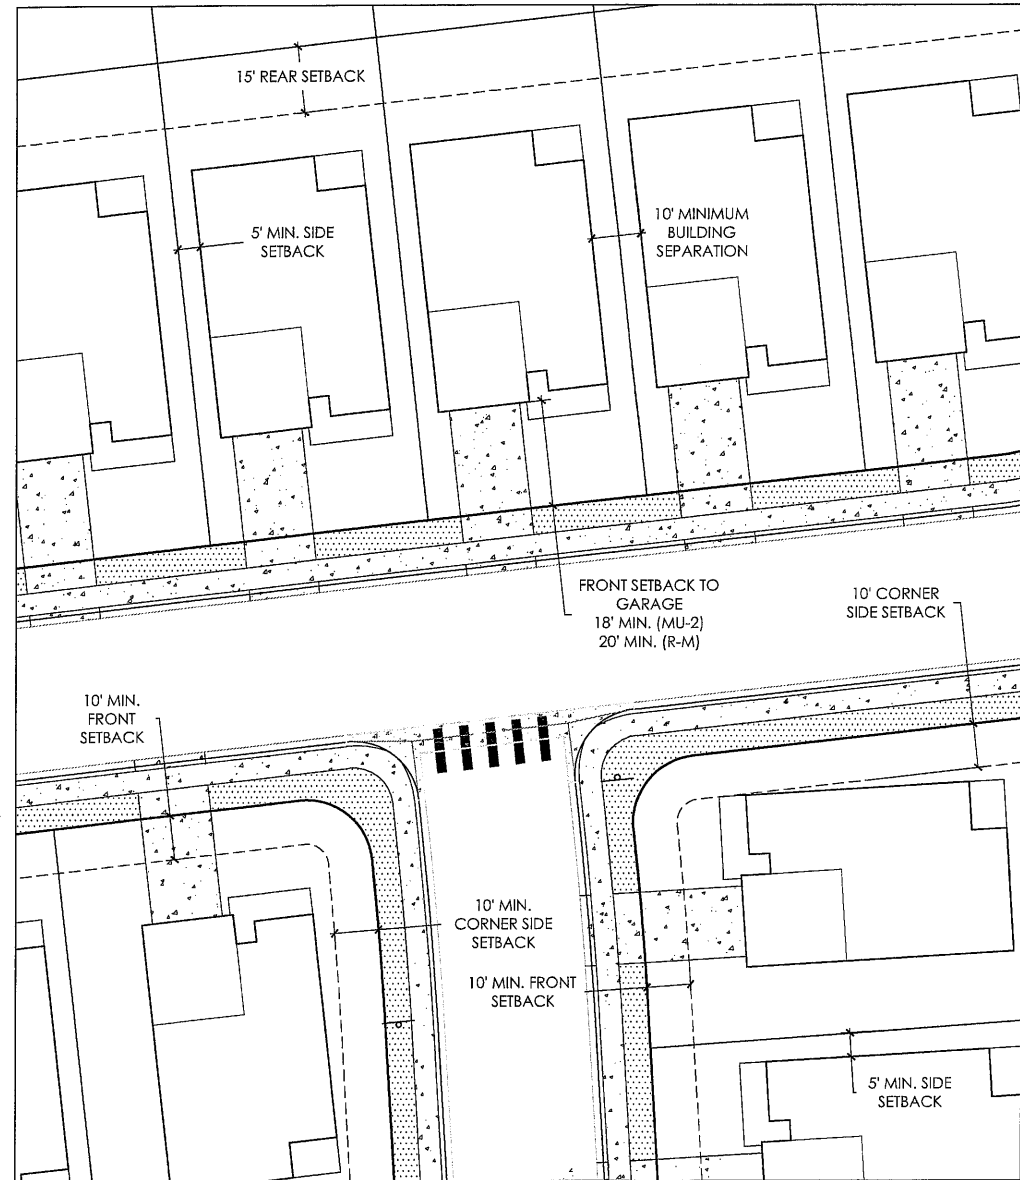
EXHIBIT A - SINGLE FAMILY DETACHED LOT TYPICAL
